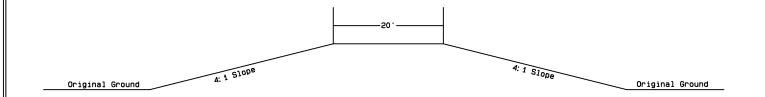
B.5-1 TYPICAL HAULROAD & ACCESS ROAD CROSS-SECTIONS
